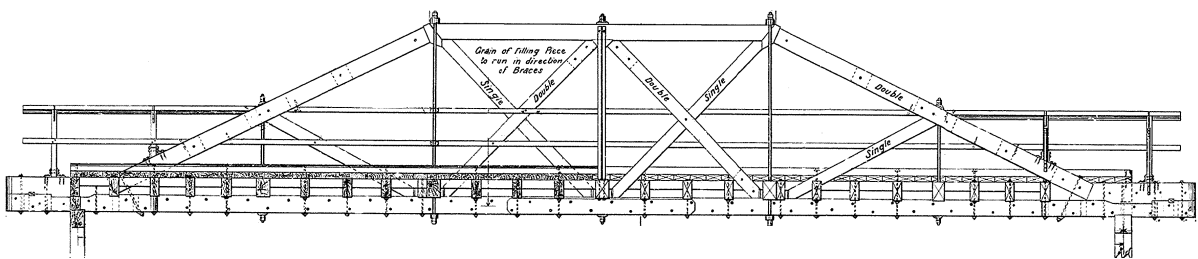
Galston George, McDonald Truss Designed 1892, Single Span 65 ft.
